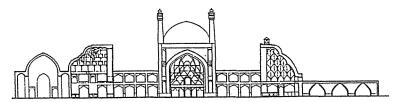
Gamie' mosque in Isfahan, section and façade, repetition on the façade, symmetry both on the façade and plan, equilibrium of sections and order on the ornaments and façade (S. G. D. I., 1978)
